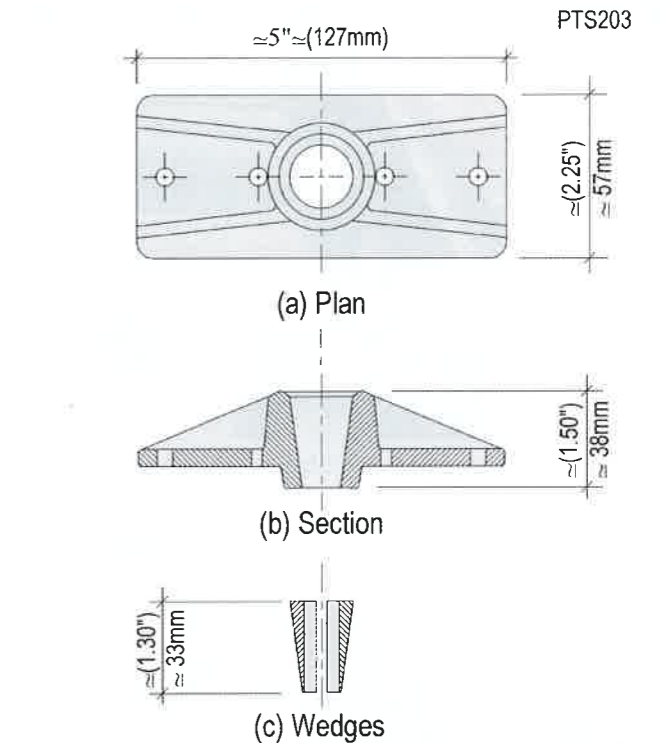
B-1 Components of the Basic Unbonded Single Strand 0.5” (13 mm) Anchorage Device
